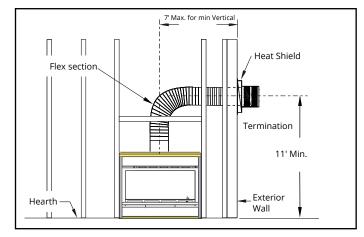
b 5"/8" Top Vented, wall mounted installation with one 90° bend. The vent run must comply with Venting Graph for Top vent, wall mounted terminations, Figure 12.
